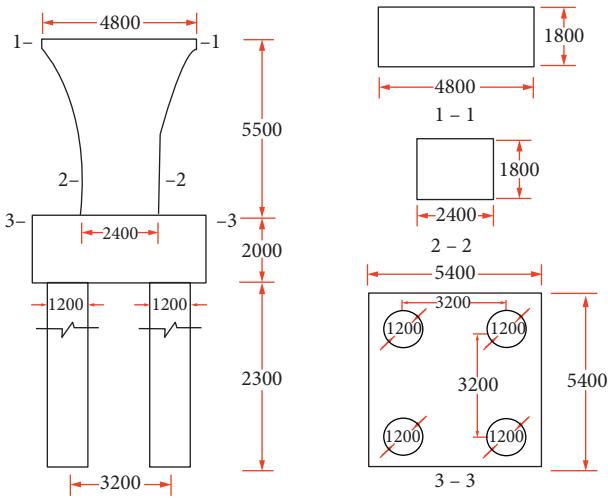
Dimension of the tested pier-cap-pile system (unit: mm).
